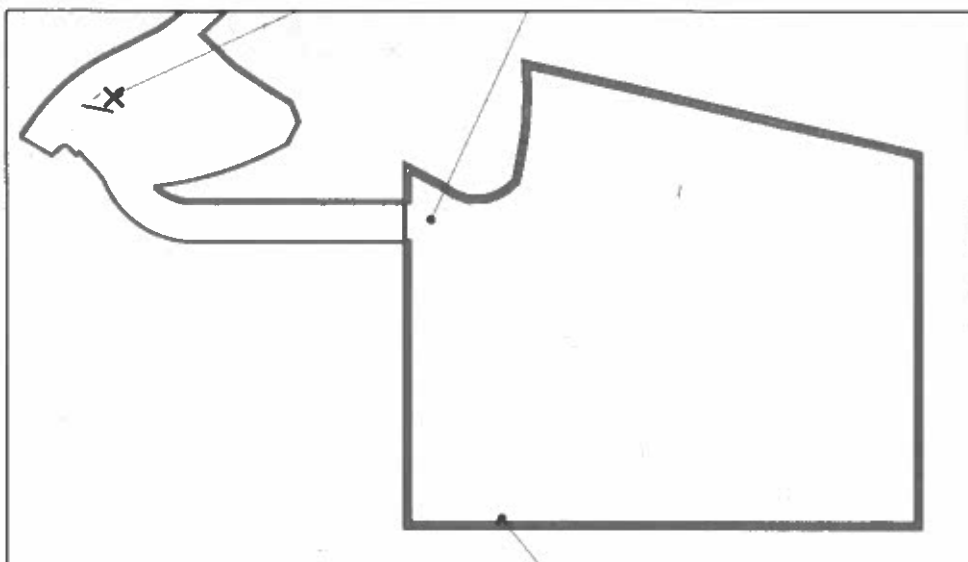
Site location drawing extract, which includes the revised access arrangement and adjoining attenuation pond. [Prepared by Reddy A+U, cropped by TPA 2022]
